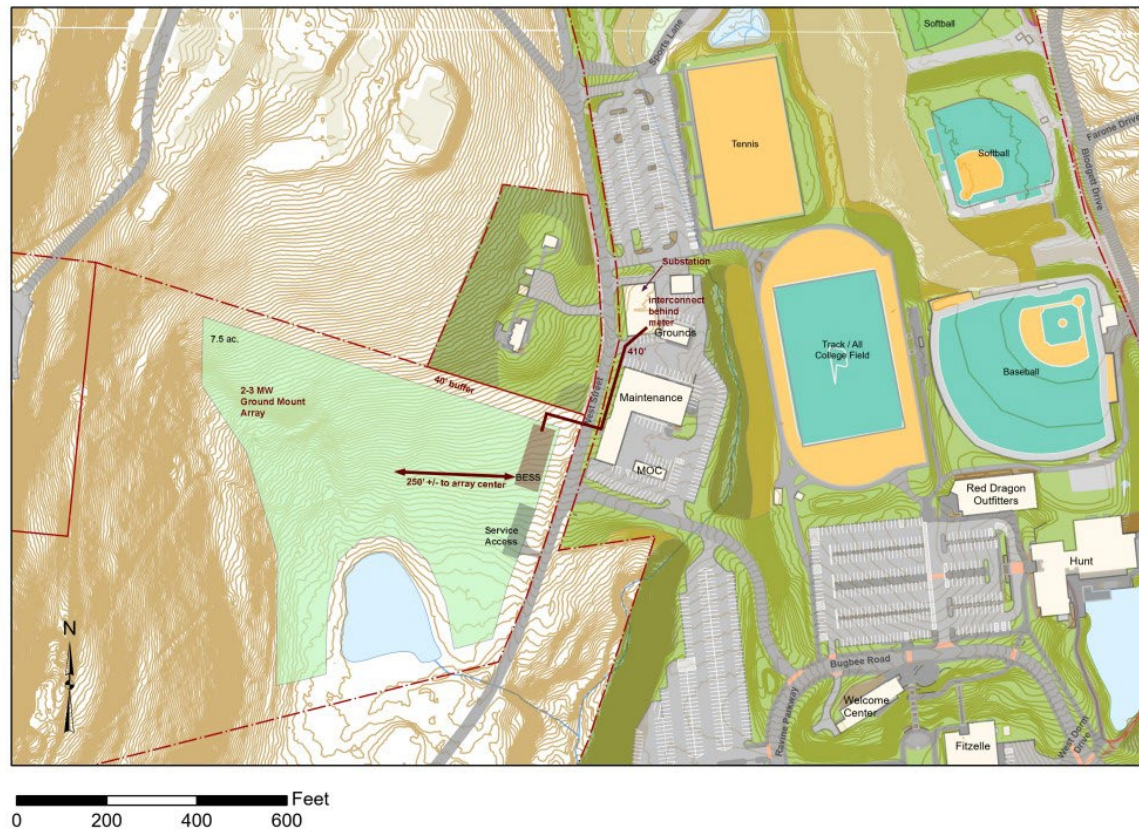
Aerial Photo of Area Designated to Solar PV and Battery Storage Construction
